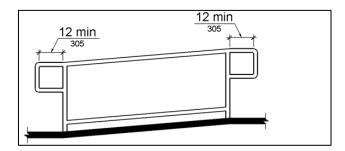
Ramp Handrail Extensions on the Top and Bottom
